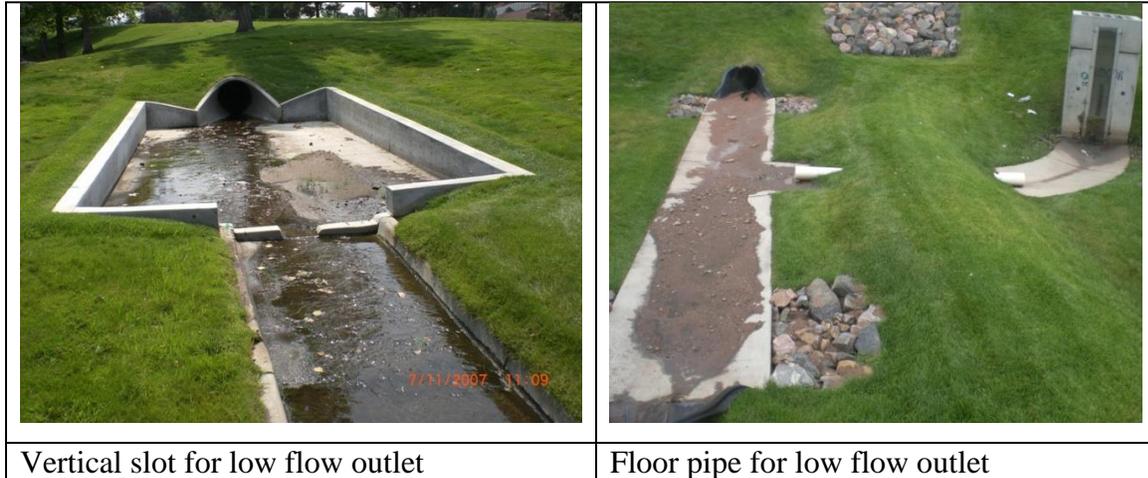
Low Flow Outlet and Trapped Sediment in Forebay
